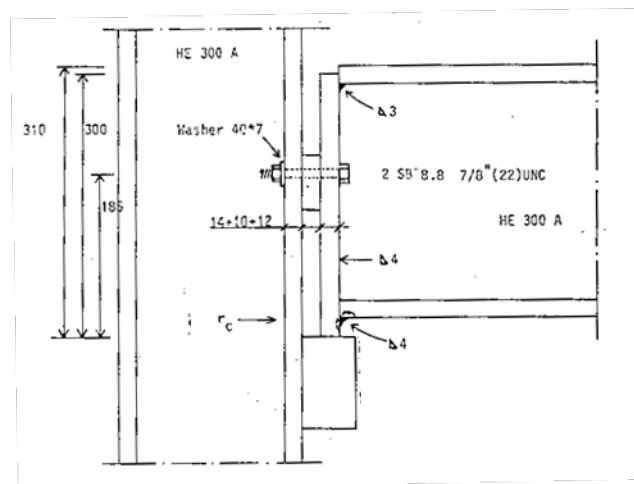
Flexible Bolted Heel Connection [9].
